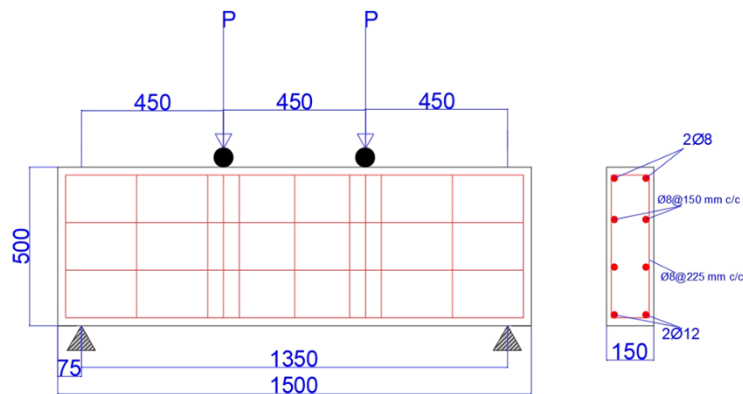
Concrete Beam Geometry and Reinforcement (all dimensions are mm)
